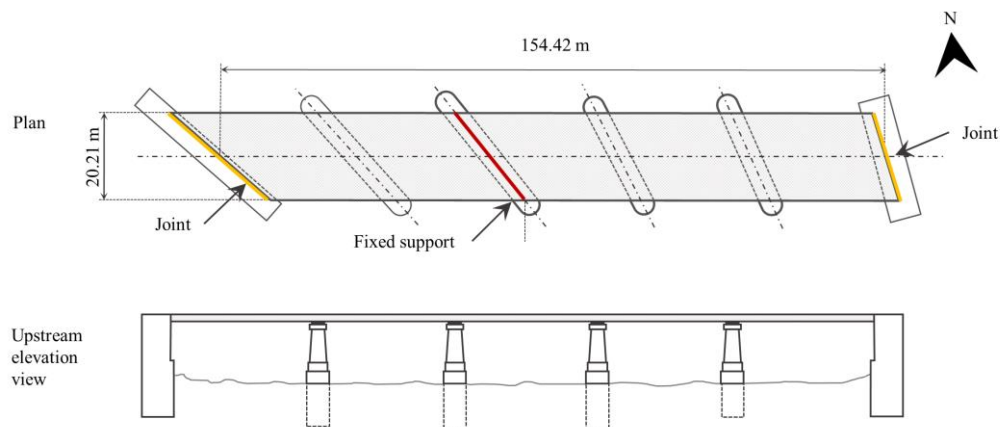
Palatino Bridge, Italy: Plan and elevation.
